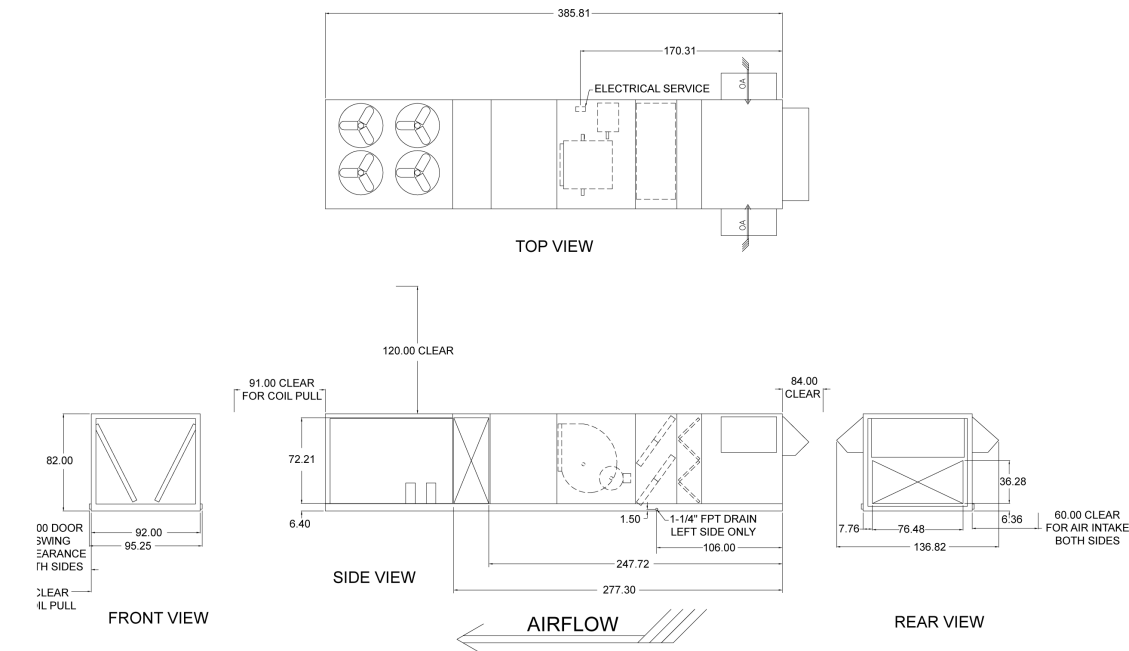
Location and dimension drawing, 050-061 models, bottom supply, side return, extended cabinet
